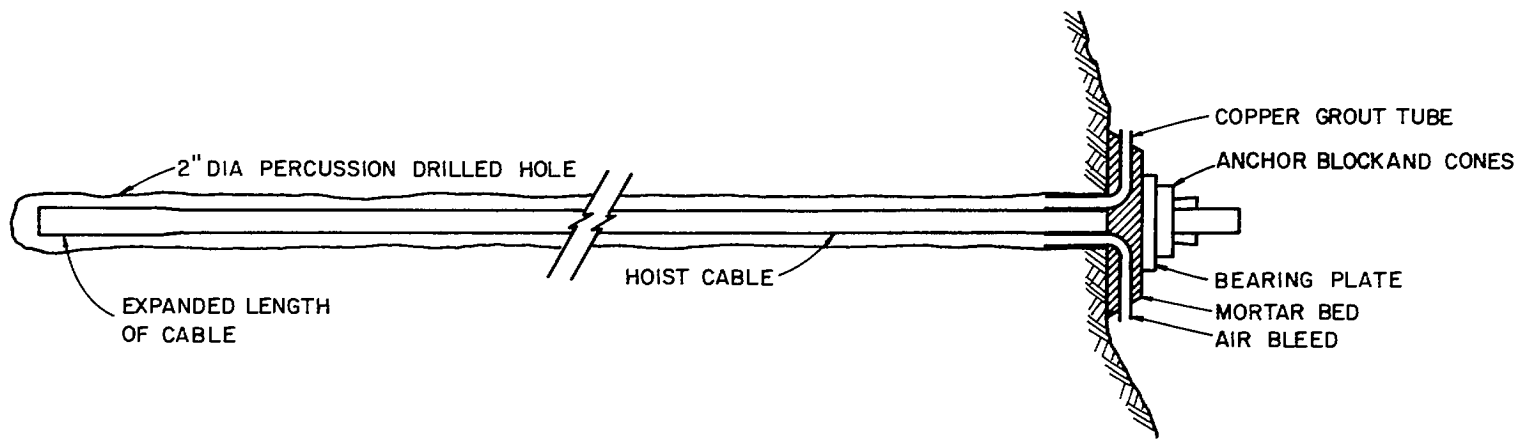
Detail of Cable Rock Anchor used in a Canadian Underground Copper Mine (10,11).
